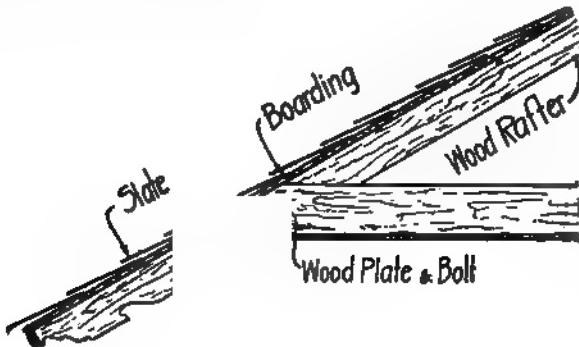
Roof-Construction at Eaves on Walls of "Nateo" Tile.
